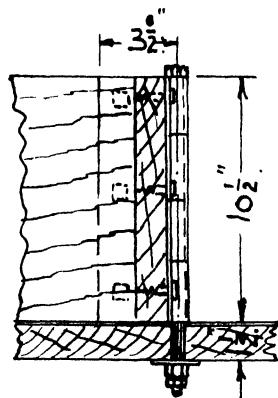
DETAIL OF HINGE FOR MOULD BOX
